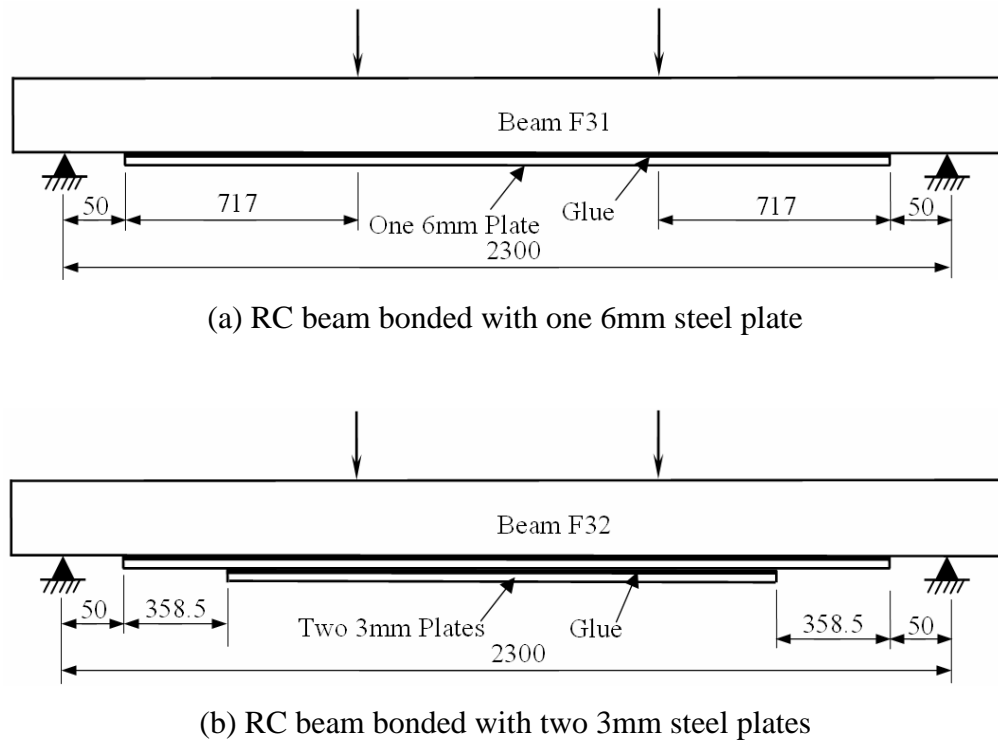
Steel plated RC beams tested by Jones et al. (1988)
